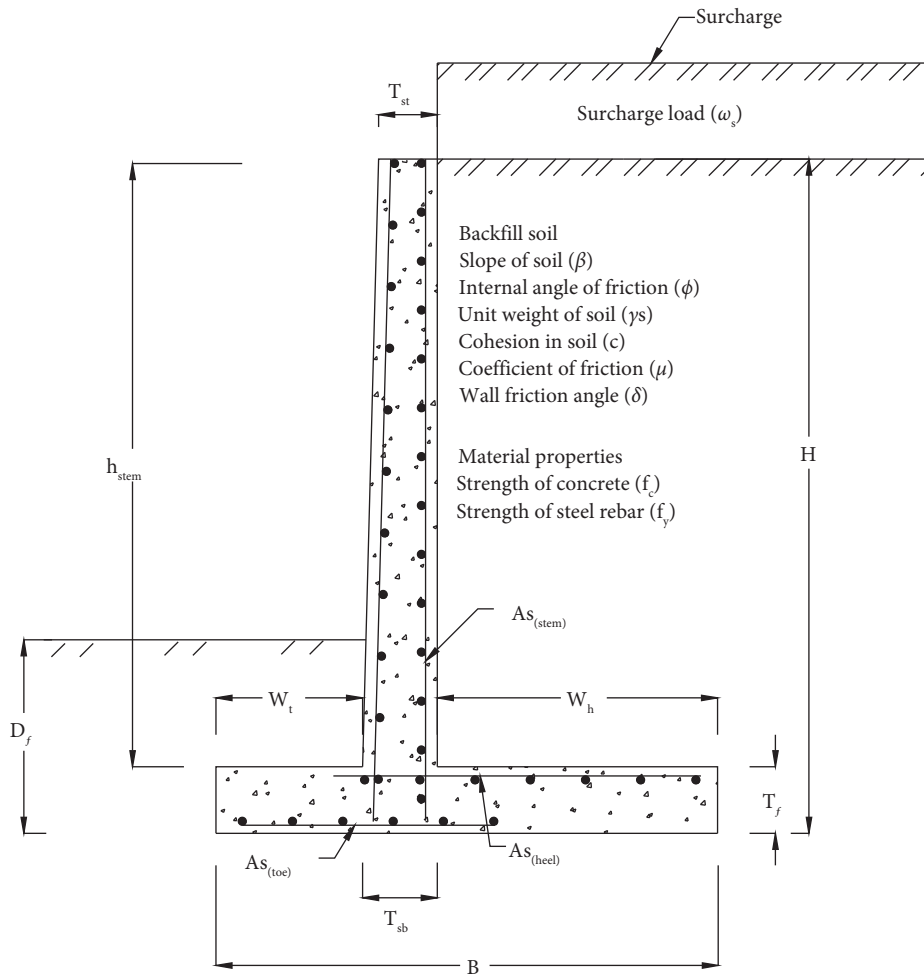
RC cantilever retaining wall with prominent variables defined.
